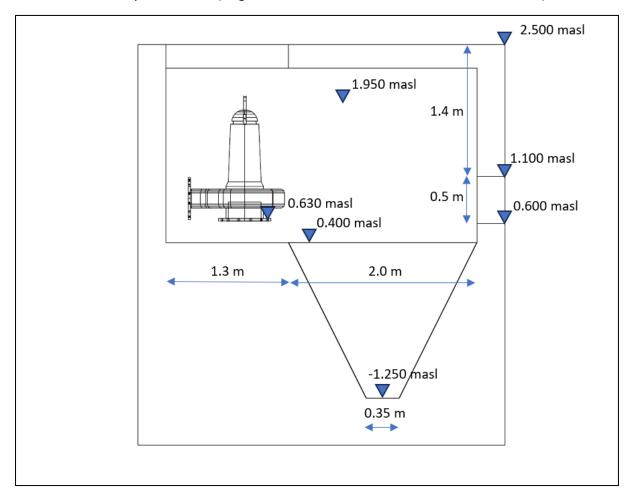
Example of section view indicating current proposed intake work elevations and key dimensions
